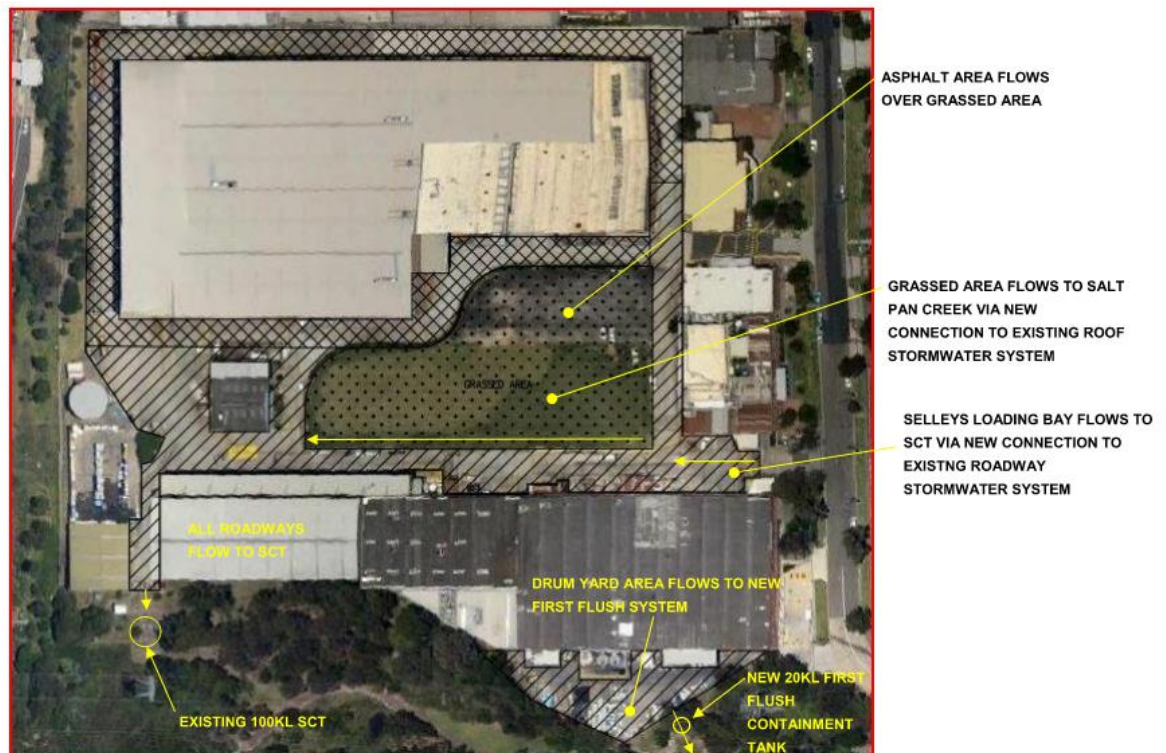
Existing Roadways and Landscape Areas (Source: Padstow Stormwater Management Plan)
